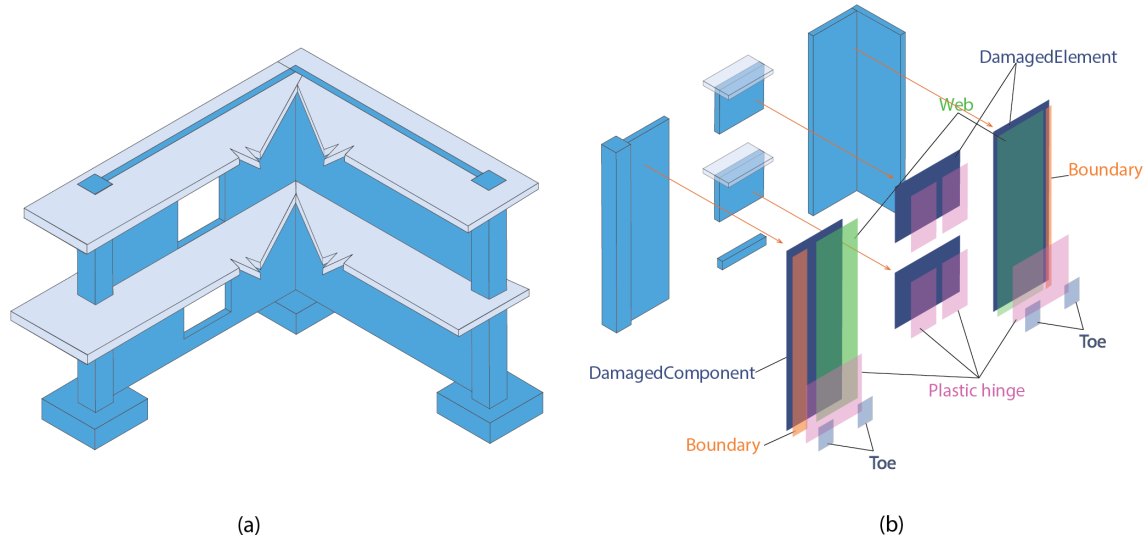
The assembly of components, which resists the earthquake forces can contain a variety of structural components, such as piers, slabs, columns, beams (a). For the damage assessment, the component assemblies are divided into segments based on their type of contribution into the non-linear mechanism (e.g., coupled pier mechanism). The DamagedElement entity represents these segments with a 2D slice across the main wall axis (b). The DamagedElementRegion entity is placed on the same plane with the DamagedElement and represents the regions on the components.
